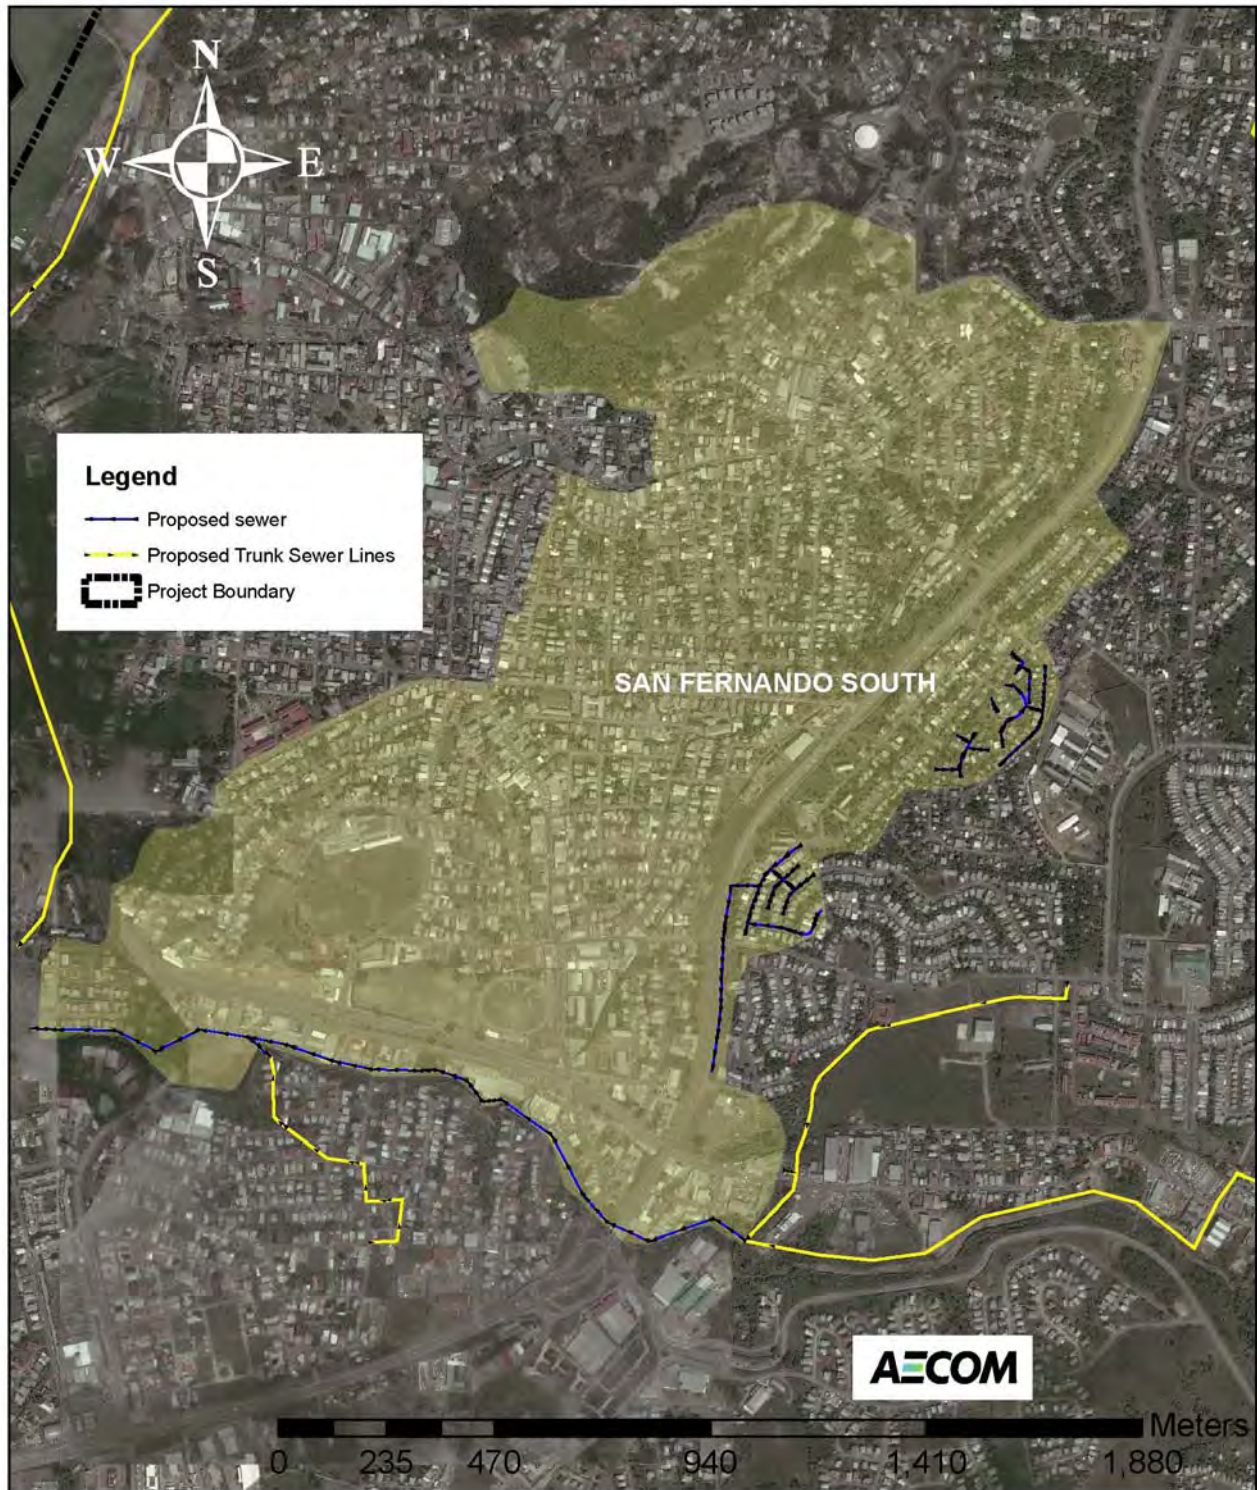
San Fernando South Subcatchment New Sewer Layout
